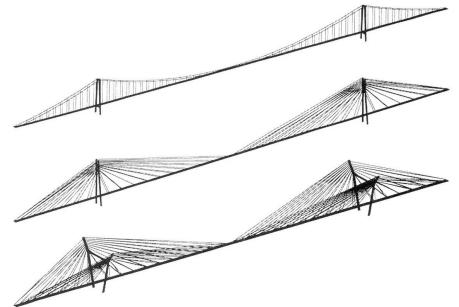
Illustrations of the three cable-supported bridges studied. Upper: suspension bridge, middle: plane (or traditional) cable-stayed bridge, lower: spatial cable-stayed bridge.
